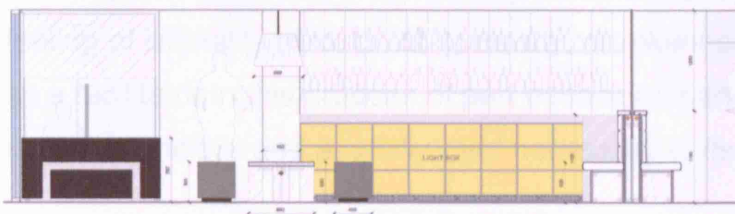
Elevation drawing of fixed furniture in the bar-space.
